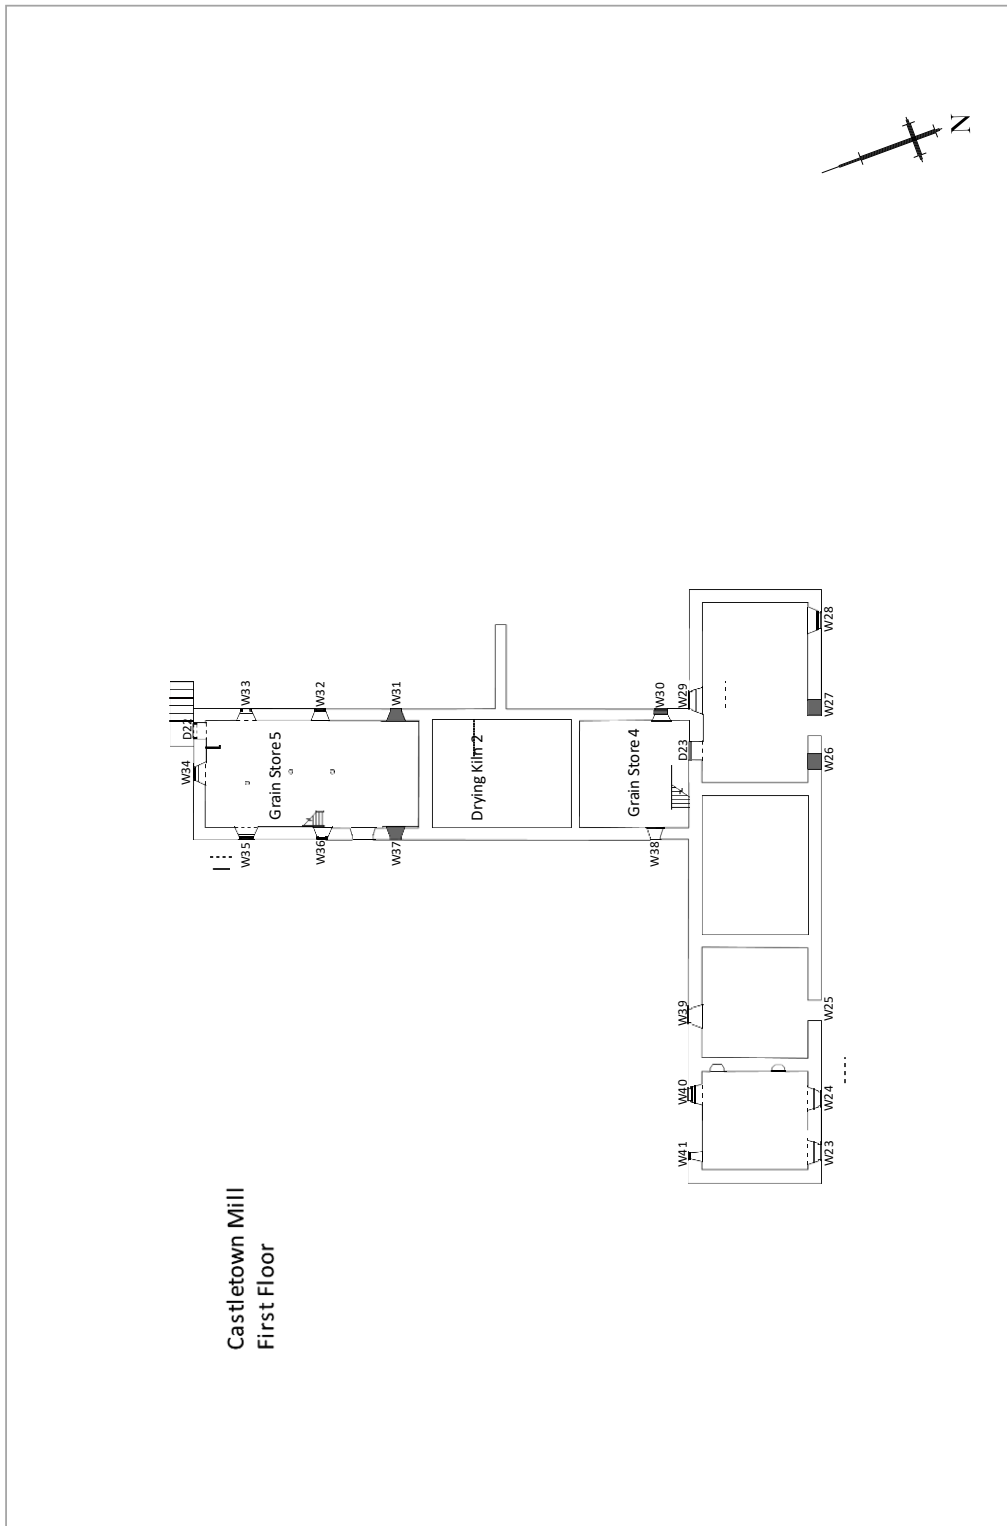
First Floor Room Plan of Castletown Mill (Including doors and windows)
